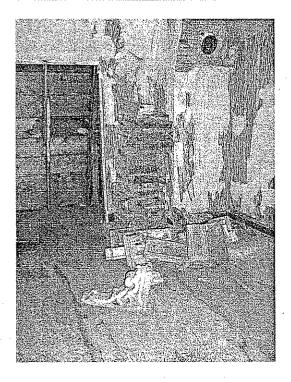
Exterior eave brackets stored on 3rd floor, c. 2002
